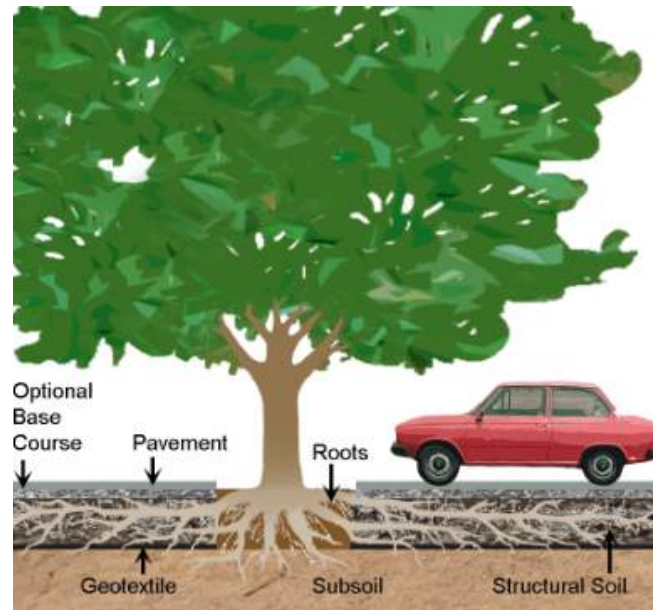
Example of suspended pavement system which uses structural soil and geotextiles (Day and Dickinson 2008).
